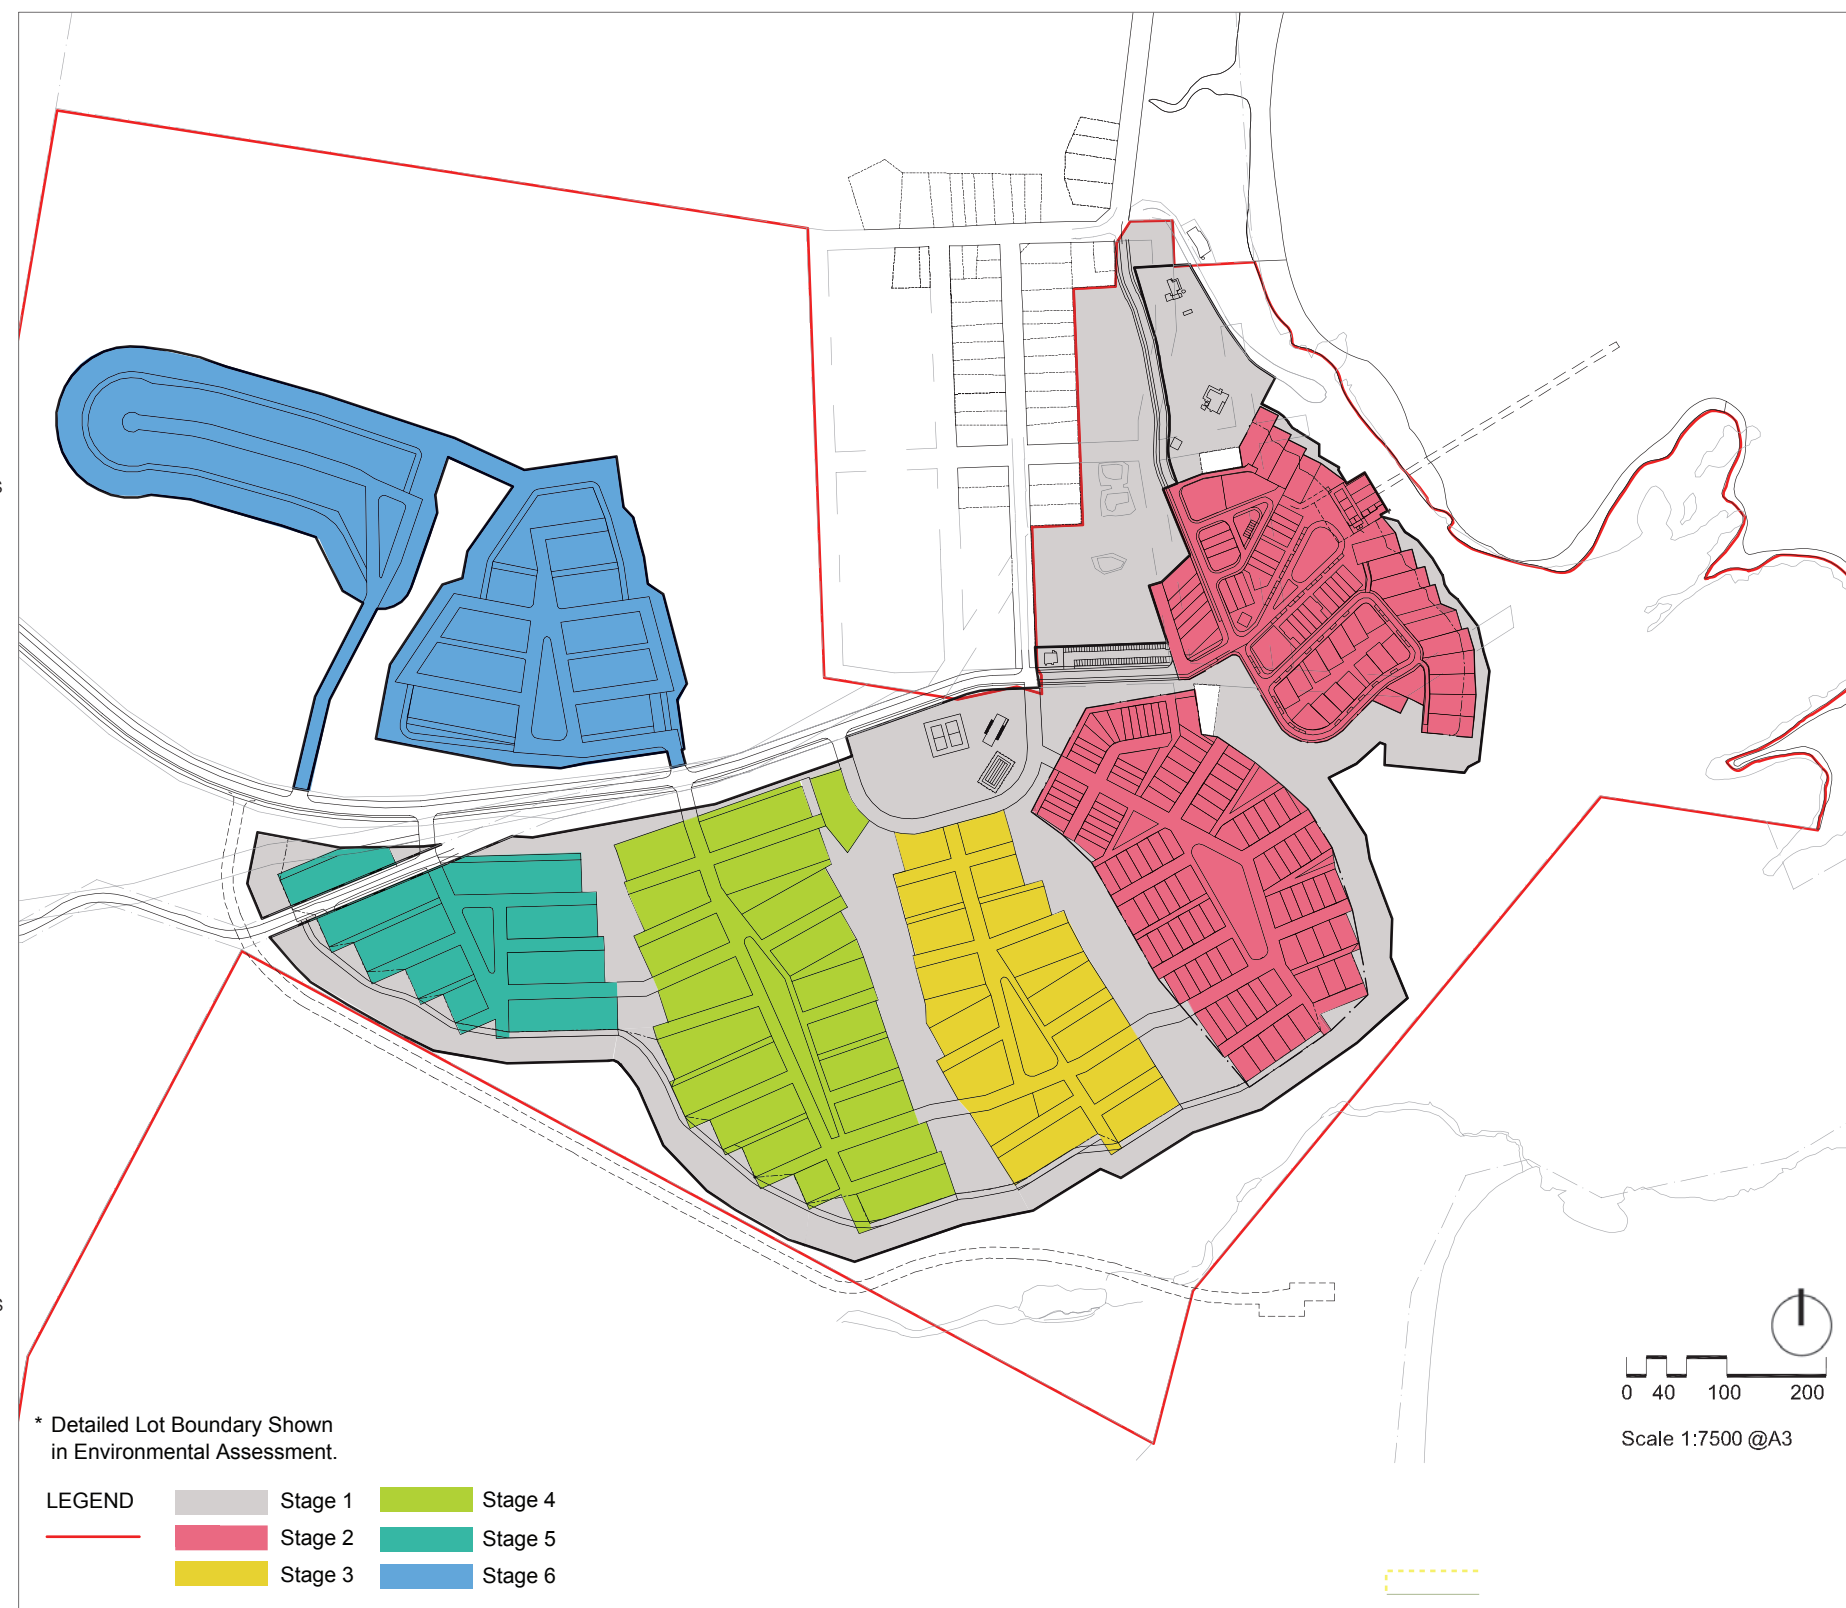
The Moonee Hamlets Staging Plan.
